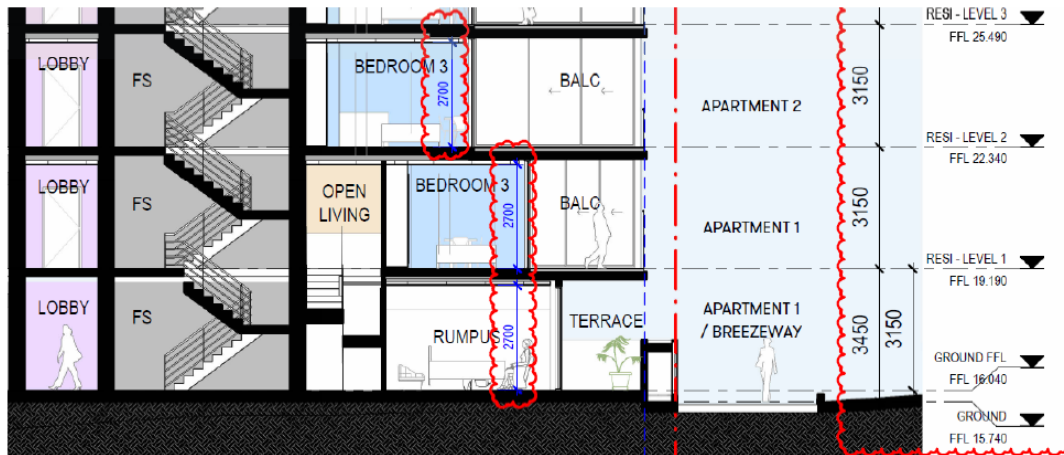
Section showing proposed floor to ceiling heights on ground and first floor
